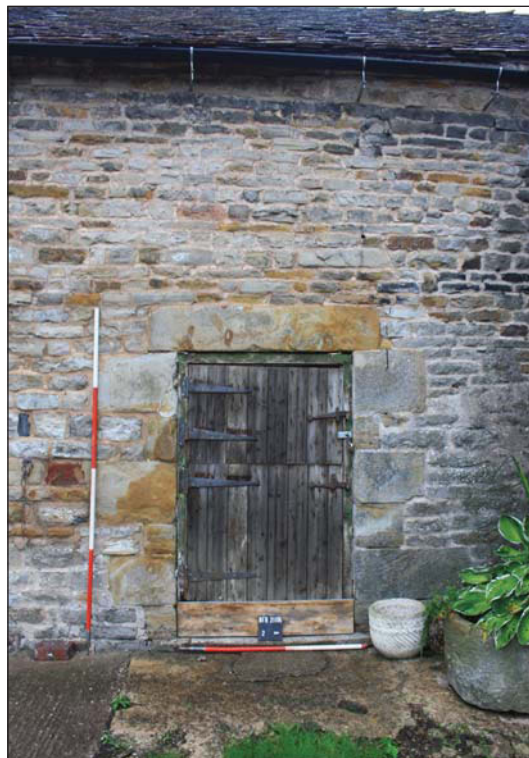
Door in north end of eastern elevation, looking west, Scales: 2m and 1m.
